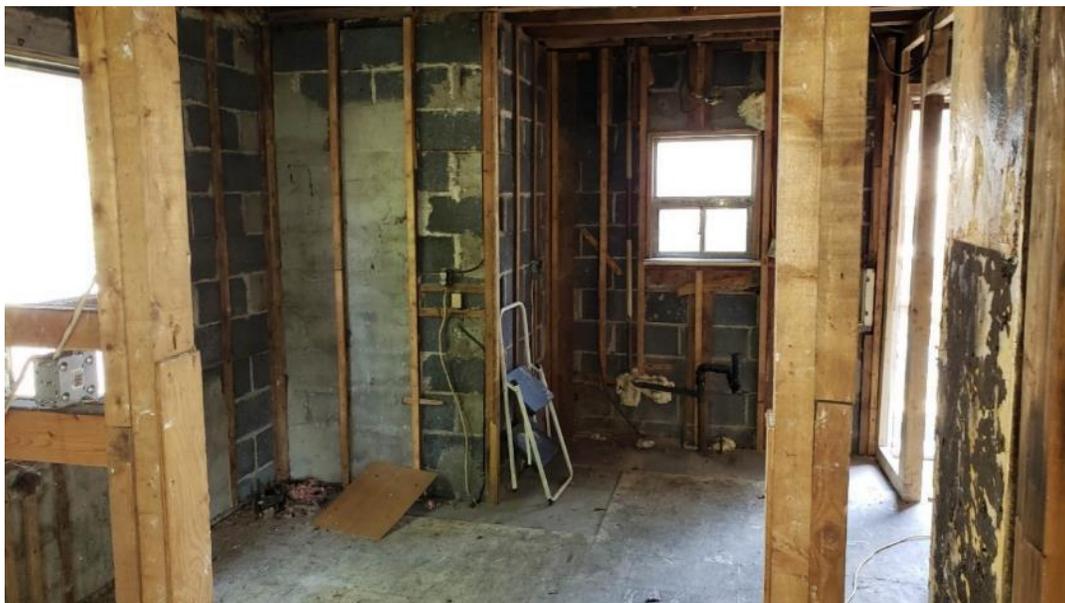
Basement fire damage, 40 Peter Street South. *(Photo from client.)
